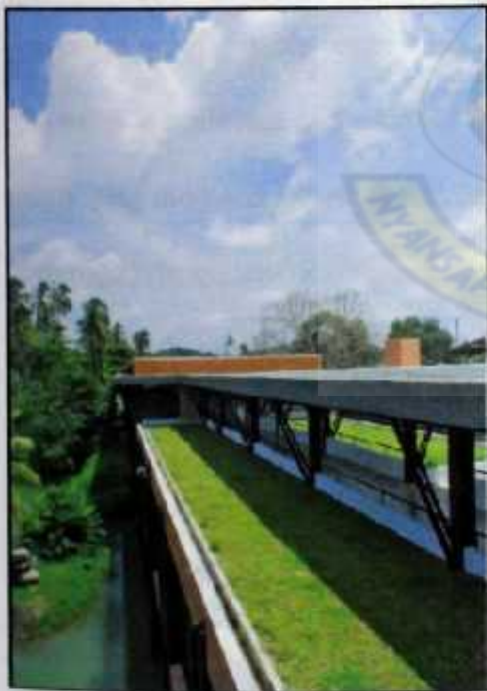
Use of stabilized earth blocks with a steel and concrete skeletal frame (above)
